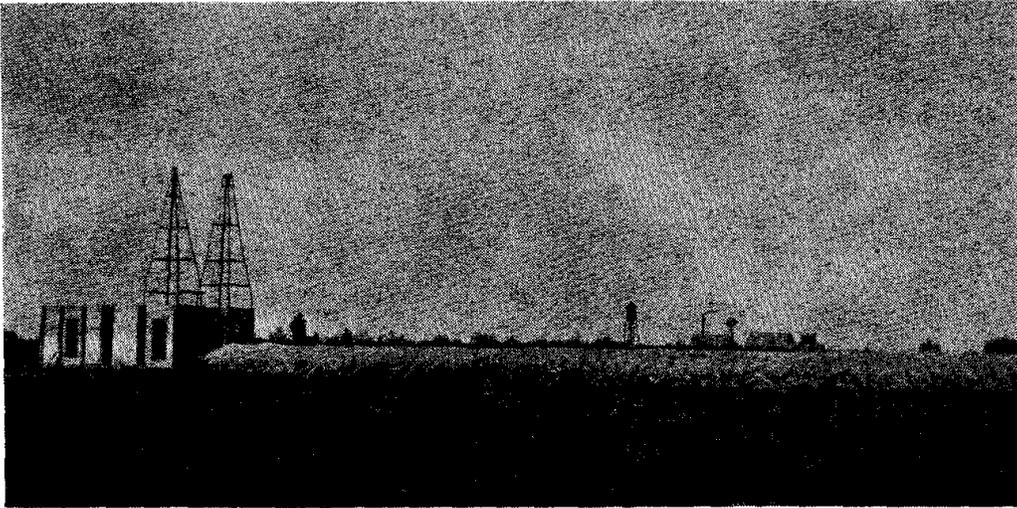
Irrigation plant and reservoir. The Legislature authorized experimental work with pump irrigation and appropriated \$5,000 for the purpose. "In 1916, a metal-lath plaster house was built over the pump and engine, and an acre-foot reservoir was built to store water for irrigation purposes."
